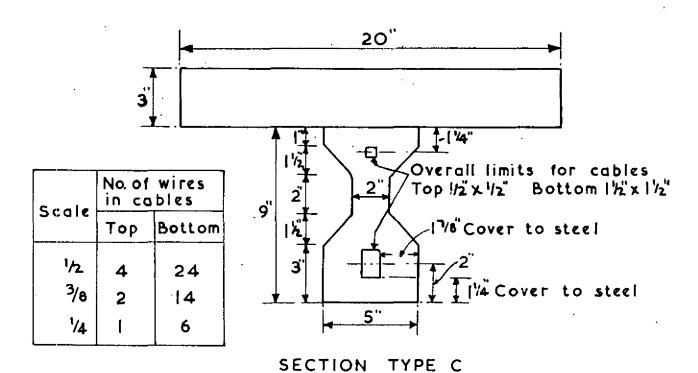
FIG. I. DIMENSIONS OF A/1/2 BEAMS
